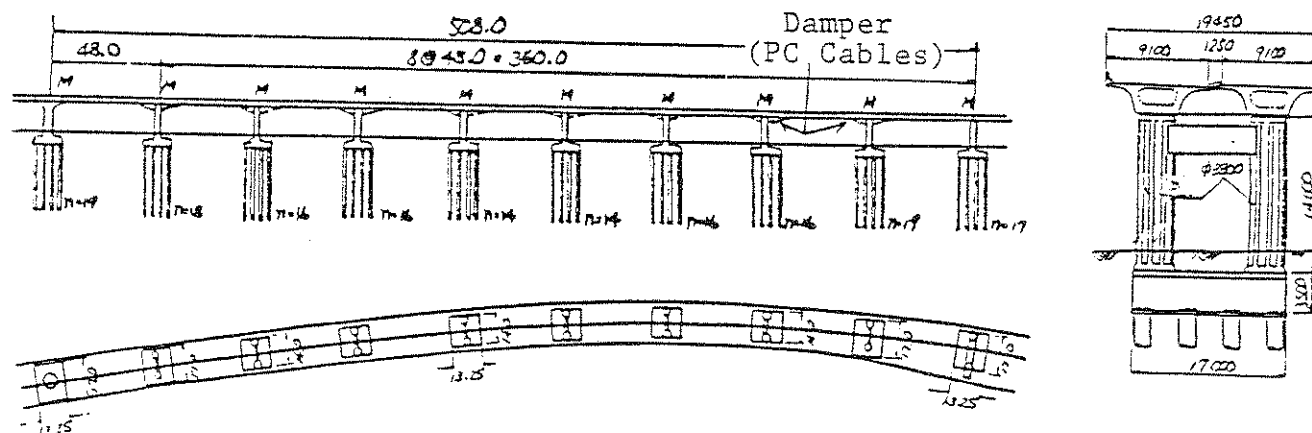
Multi-span Continuous Girder Bridges: General Layout
